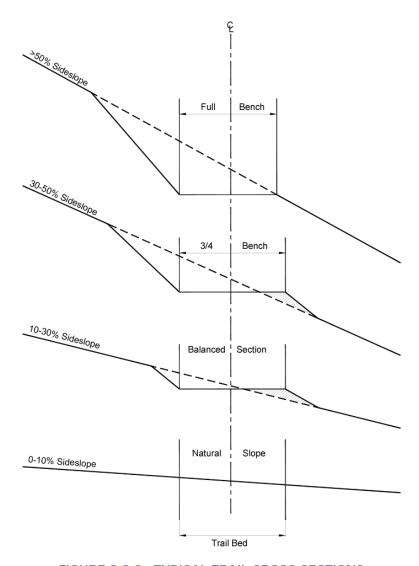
TYPICAL TRAIL CROSS SECTIONS
